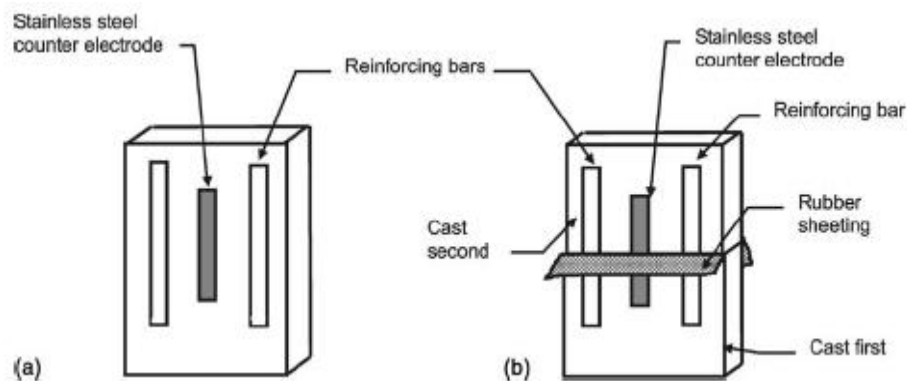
Diagram showing specimen with 2 entrenched bars (a) uncracked (b) precracked [36]
